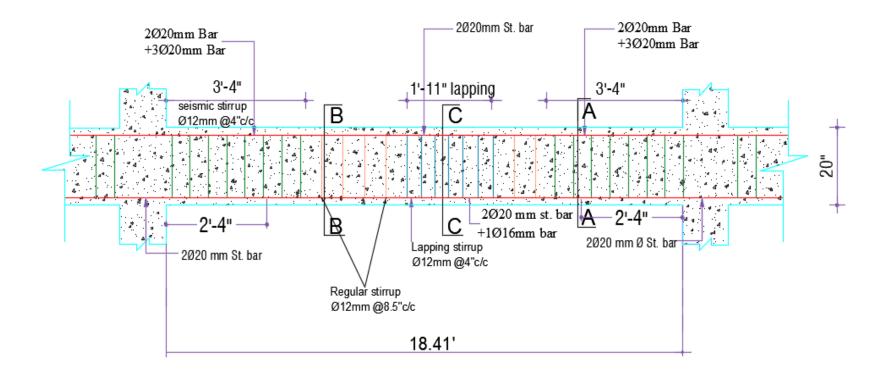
Longitudinal Section Reinforcement of Beam
